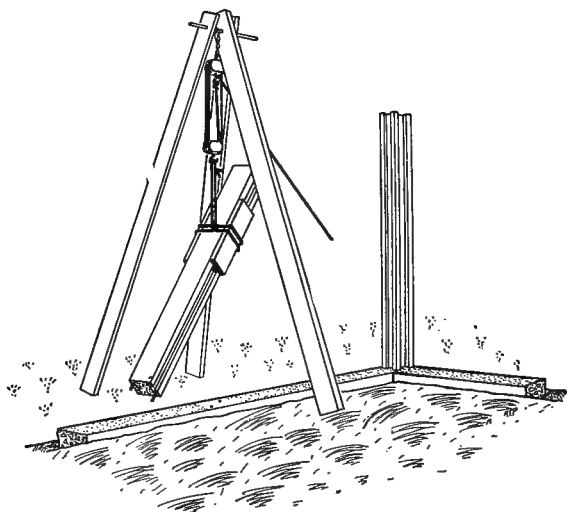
Tripod, Block and Tackle for lifting and placing columns and slabs.
